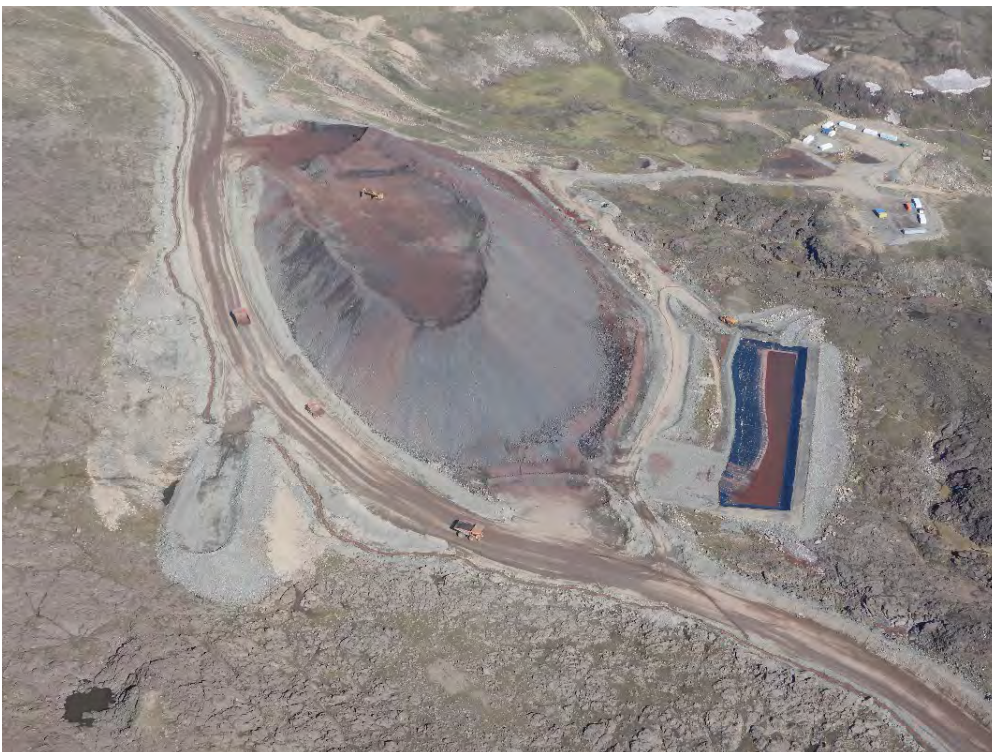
Aerial View of Cross-cut 570 Hill Side Road – July 2023
